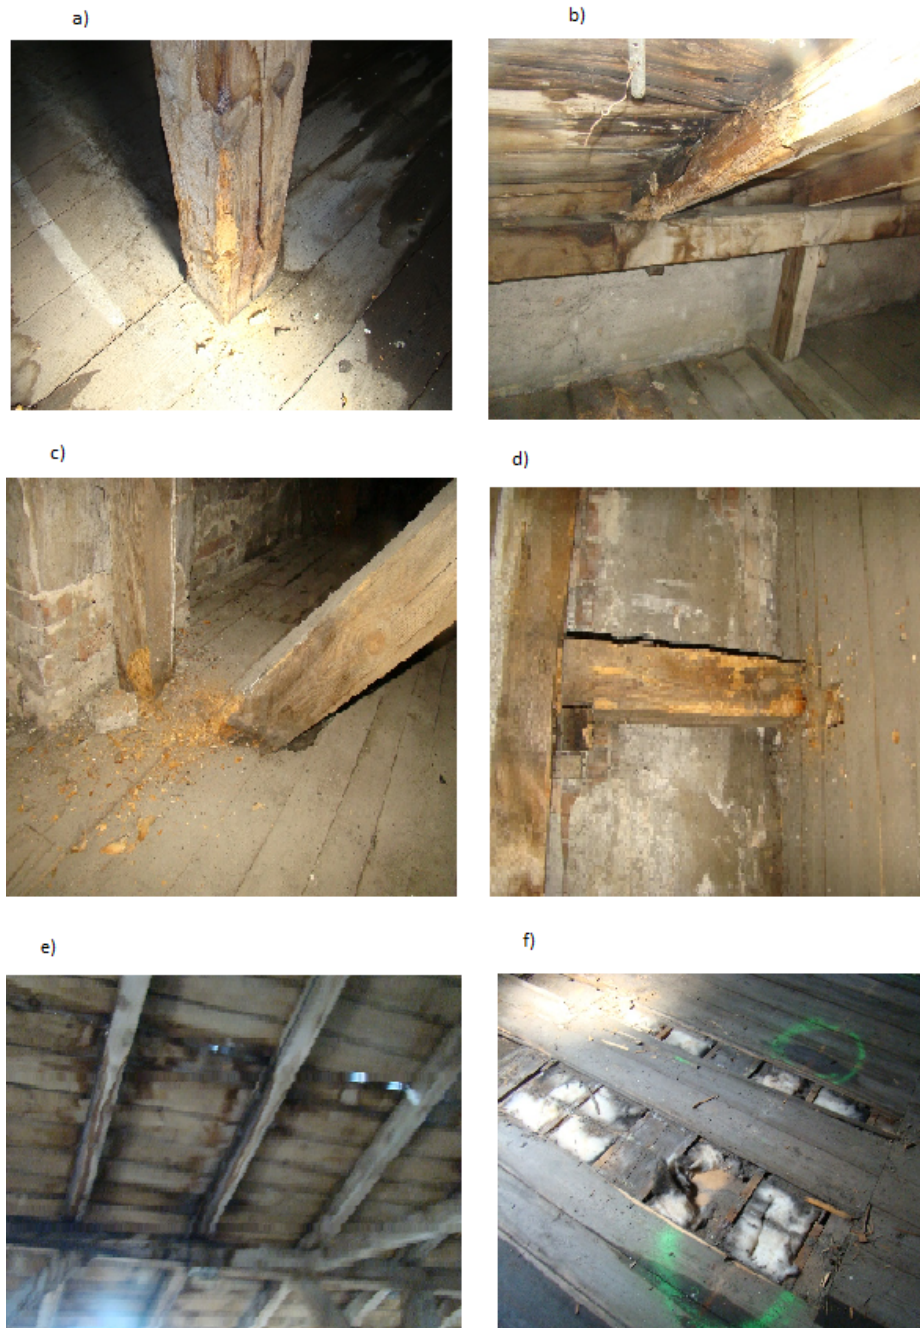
Building planned for modernization - attic: damage to the wooden roof truss in terms of: a) post foundation, b), c) rafter backrest, d) wall board support, e) roof formwork, and f) ceiling structure above the second floor
